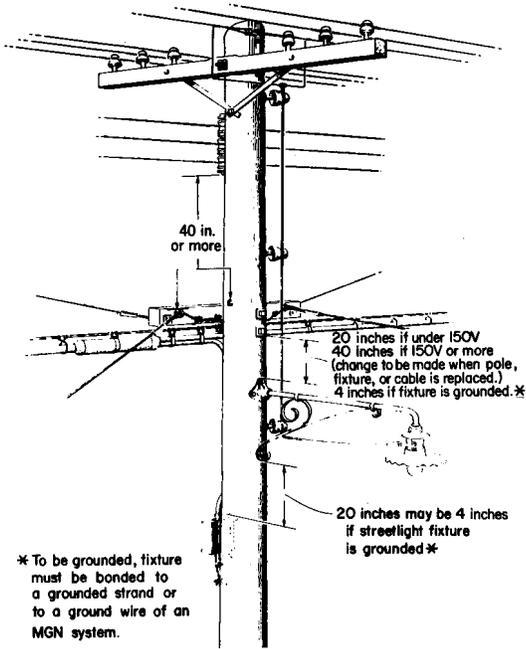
Clearances of Cable and Pole-Mounted Terminal From Streetlight Fixture Mounted Below Cable
